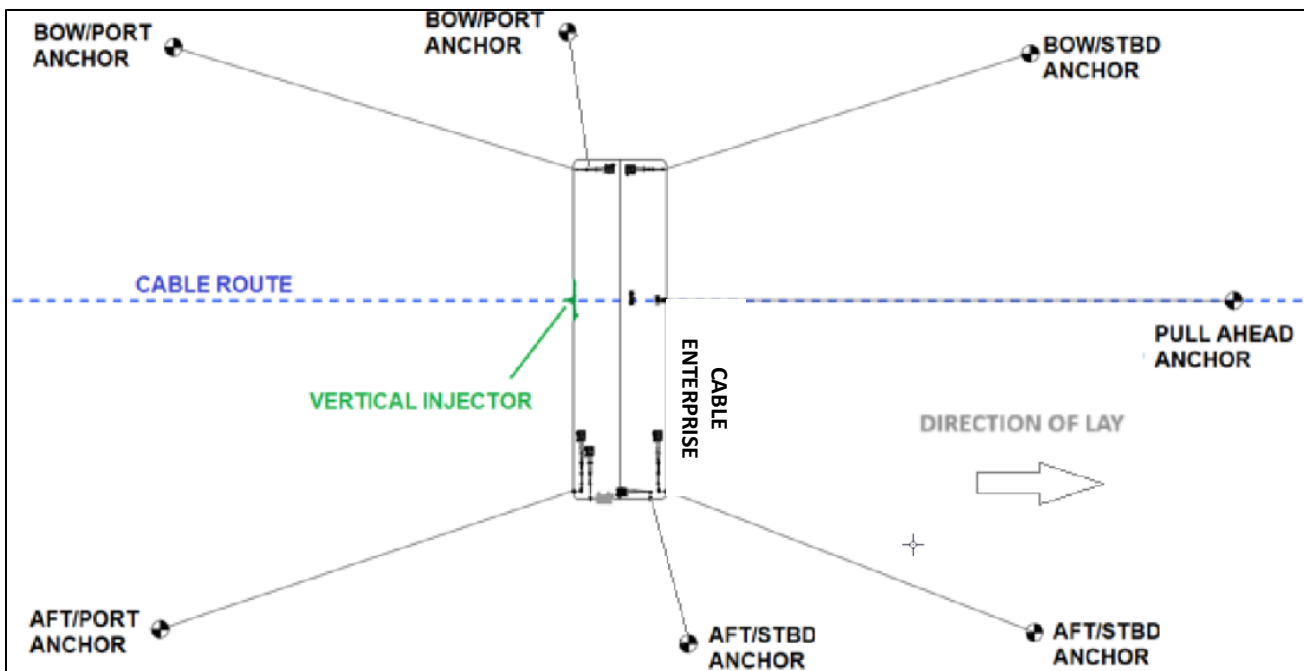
Planned anchor configuration for Cable Lay Barge(s)
